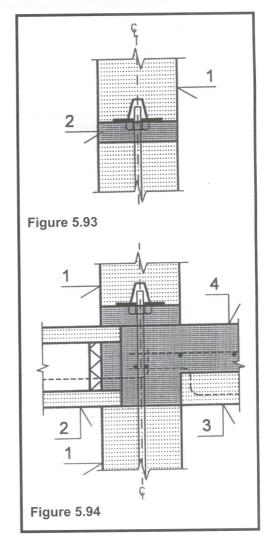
Load Bearing Wall-Load Bearing Wall
